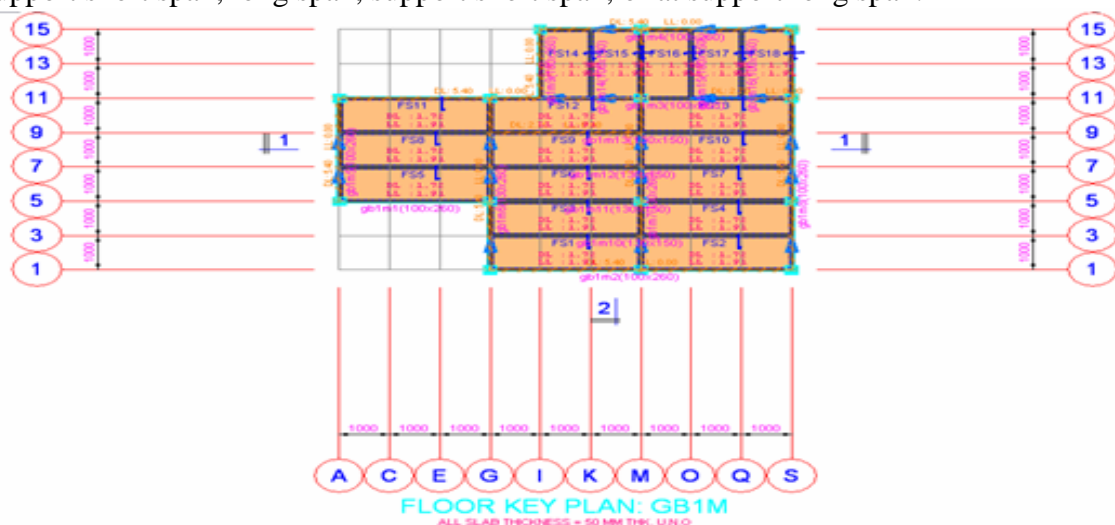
The Plan for Building which consists of Ribbed Slab, Beam, and Column
